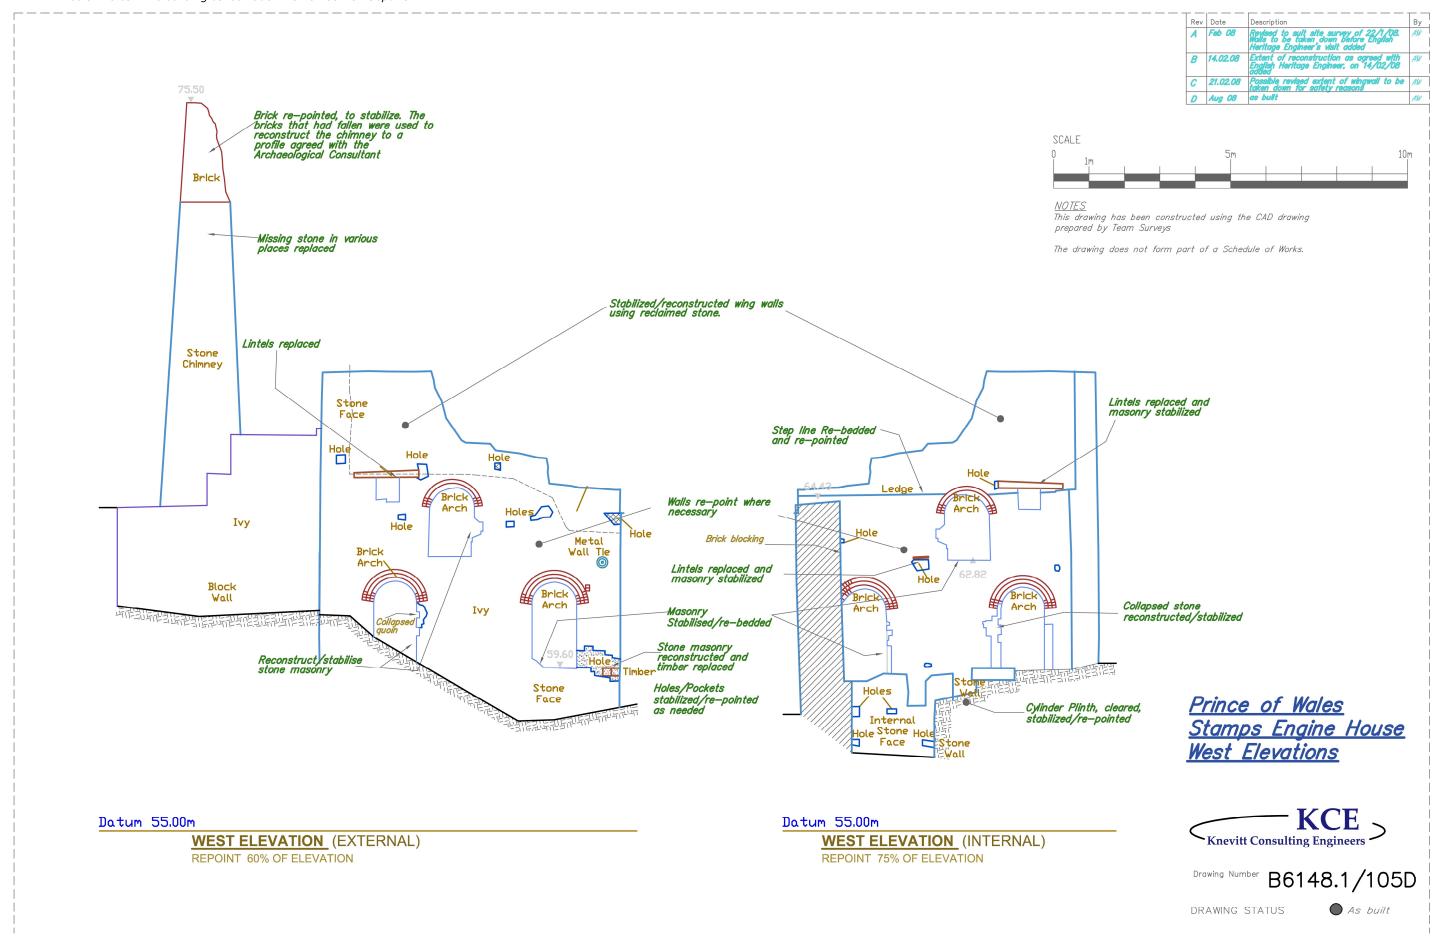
'As built' annotated West elevation surveys of the stamps engine house and chimney after works (Knevitt Cons. Engs. 2008)
